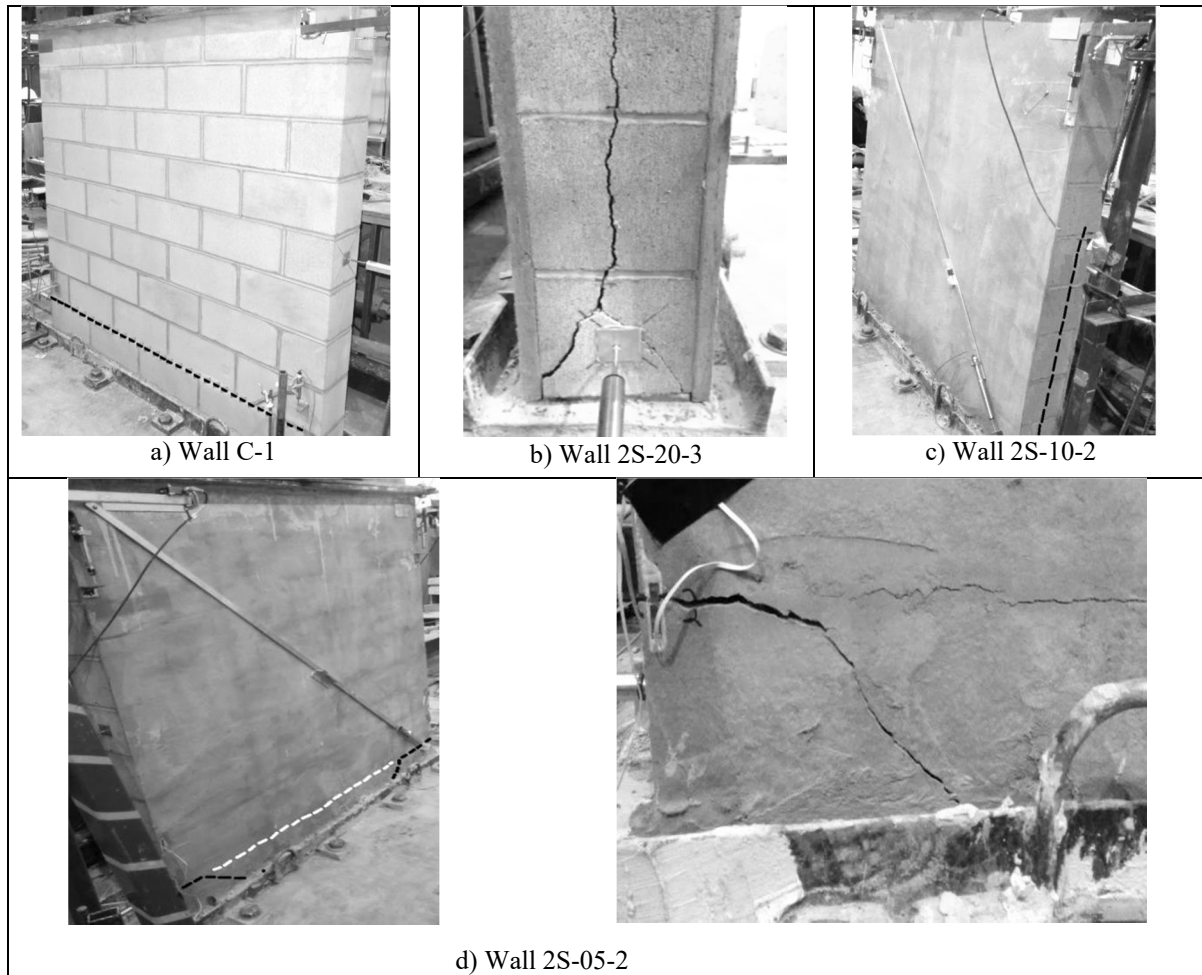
Crack pattern (a) Wall C-1 (b) Wall 2S-20-3 (c) Wall 2S-10-2 (d) Wall 2S-05-2
